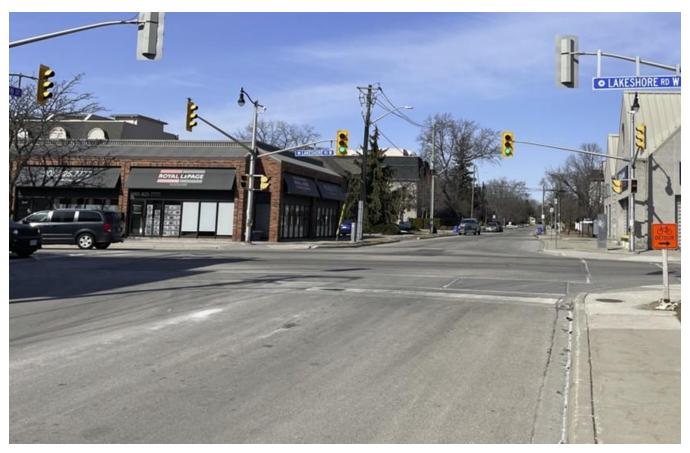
Faded Pavement Markings at Lakeshore Road West and Nelson Street
